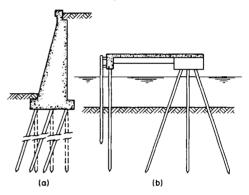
Raking piles to resist lateral loads. (a) Beneath retaining wall; (b) in a marine berthing structure
